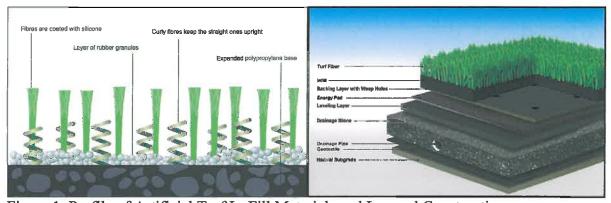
Profile of Artificial Turf In-Fill Materials and Layered Construction
